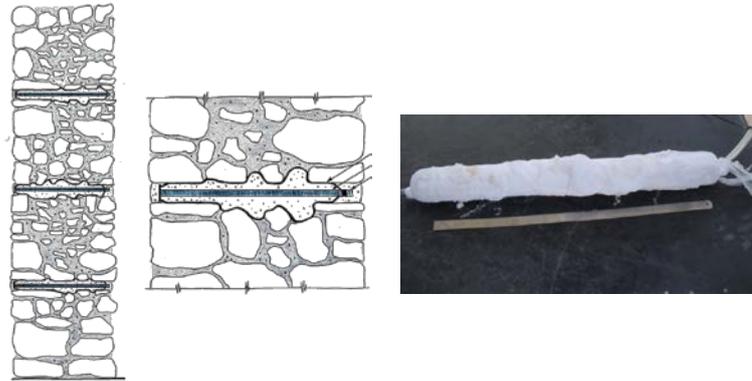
Panel n. 3 – Injection anchors with sock-like headers – schematic plan for irregular stonework (transversal section) and header photo after panel test.
